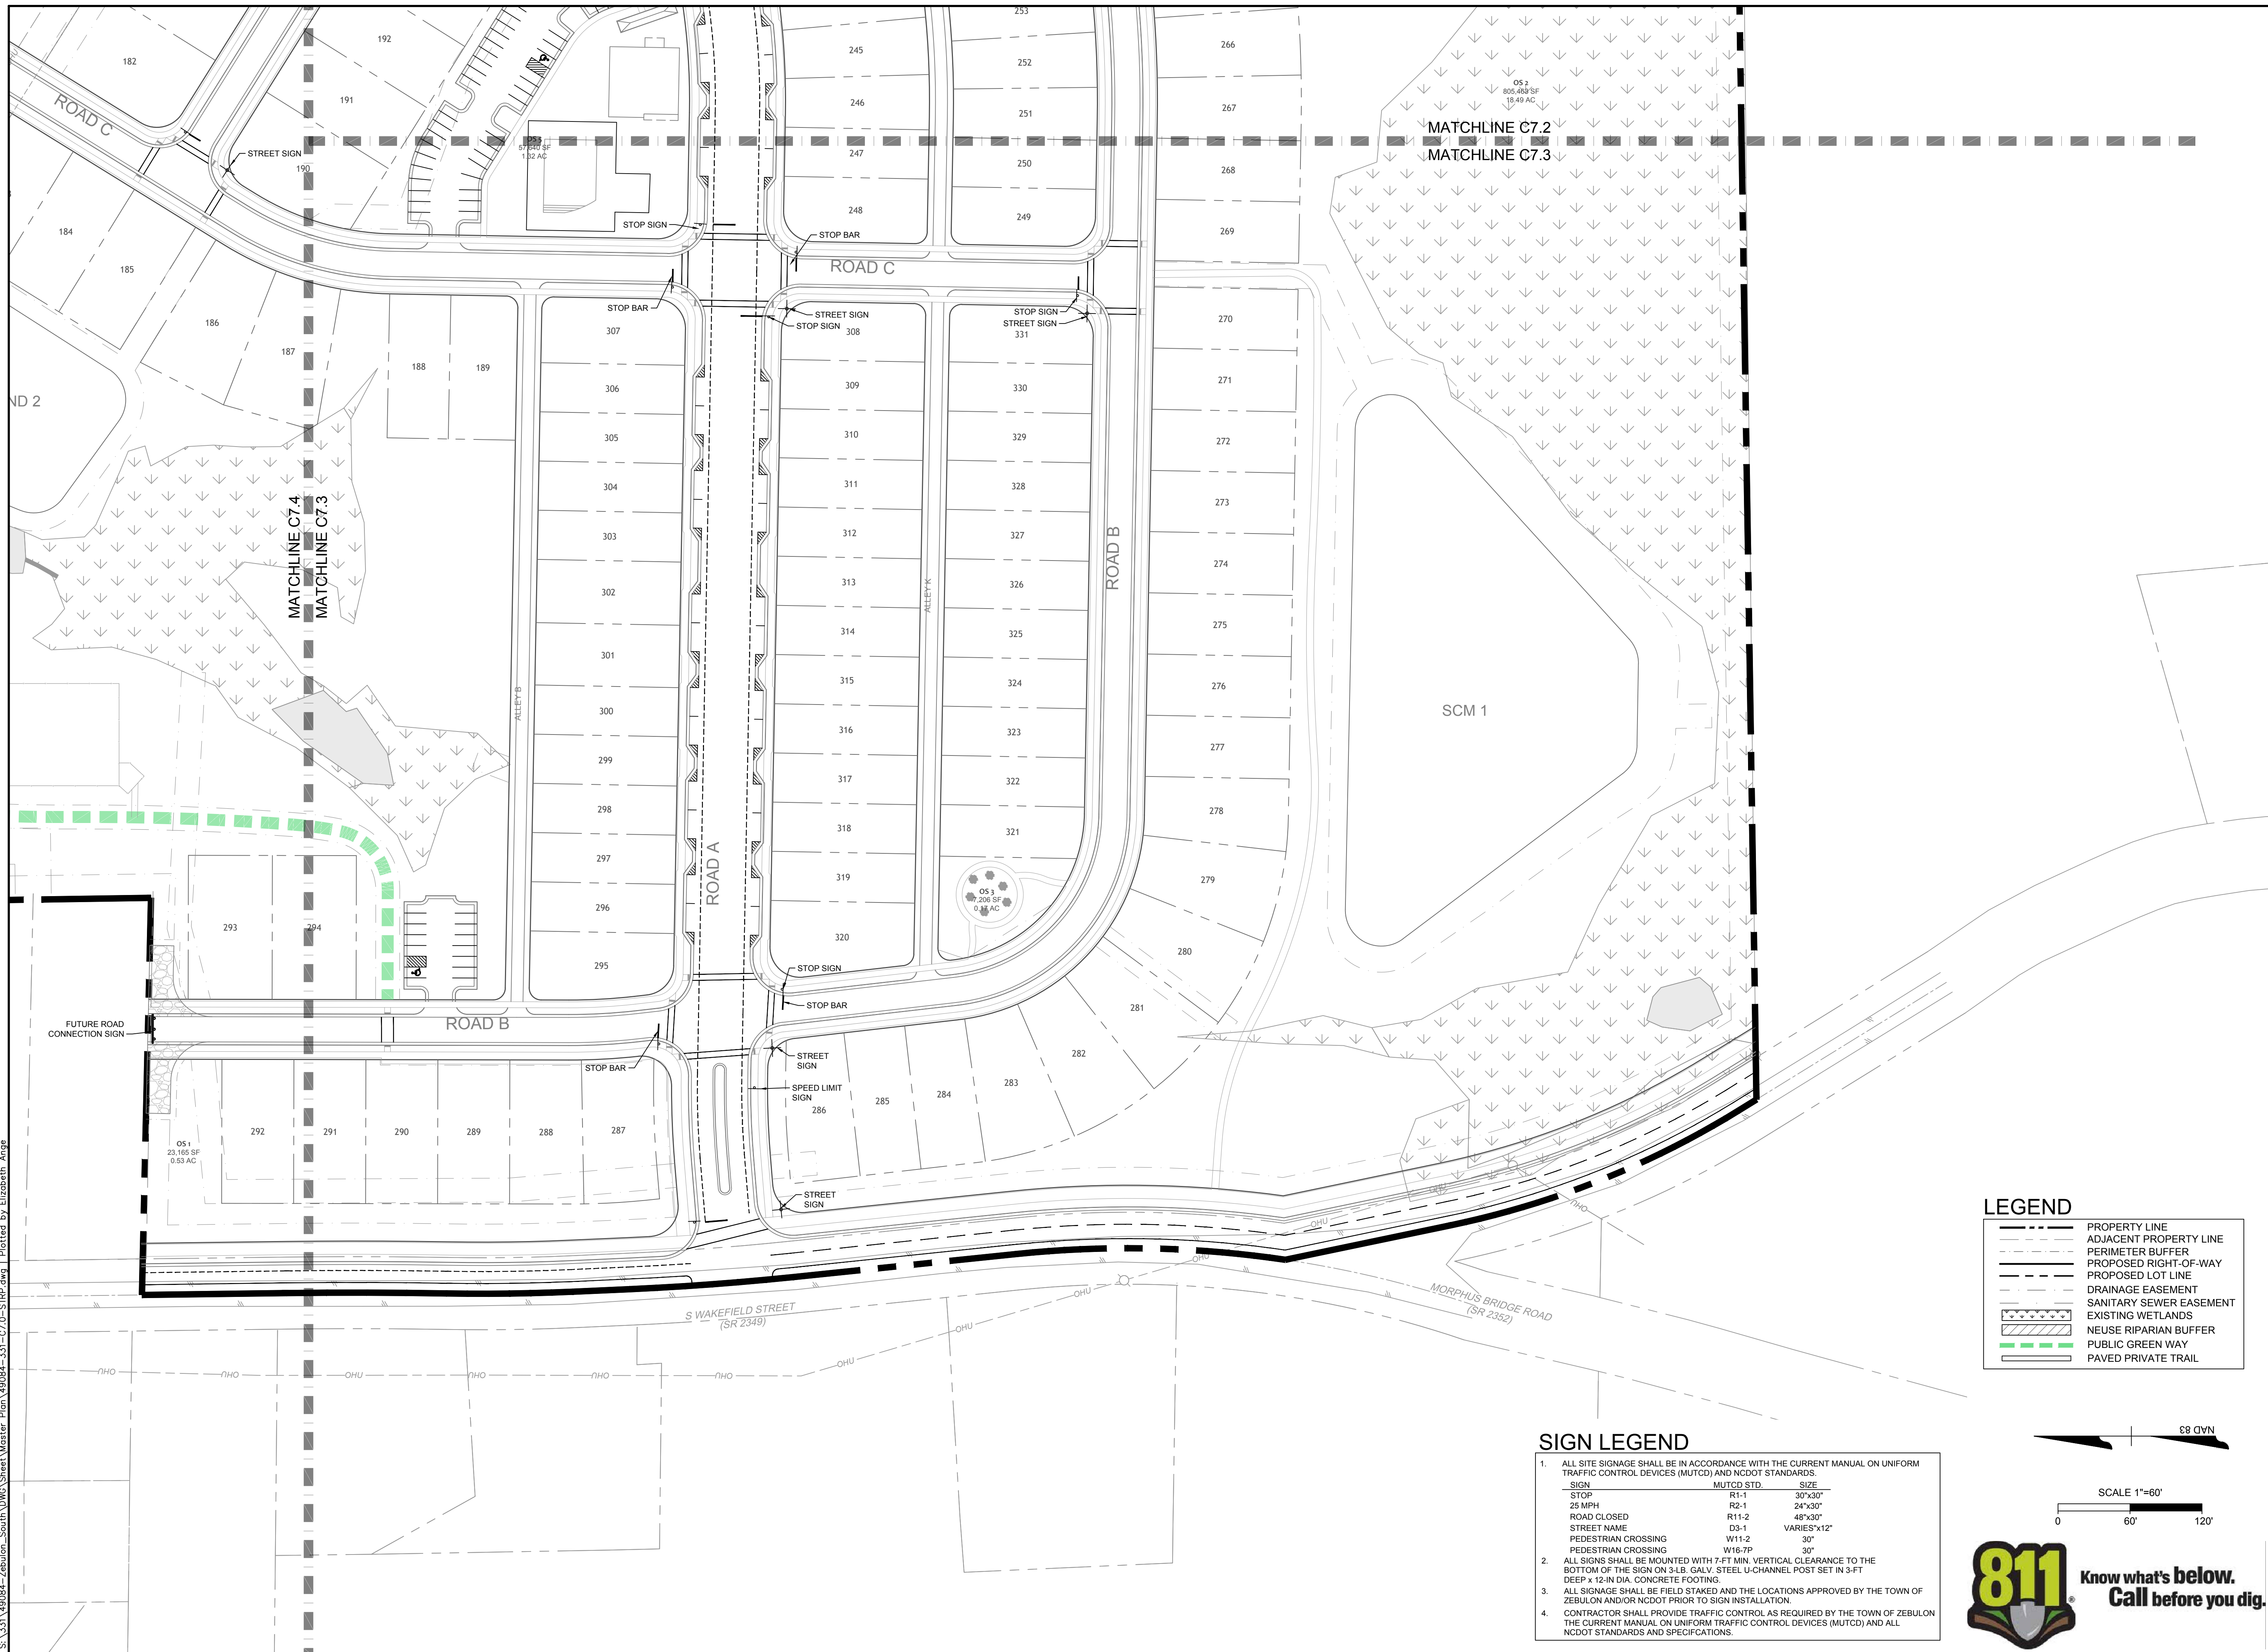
## DETAILED SIGNS & MARKINGS PLAN SHEET 2 OF 4
